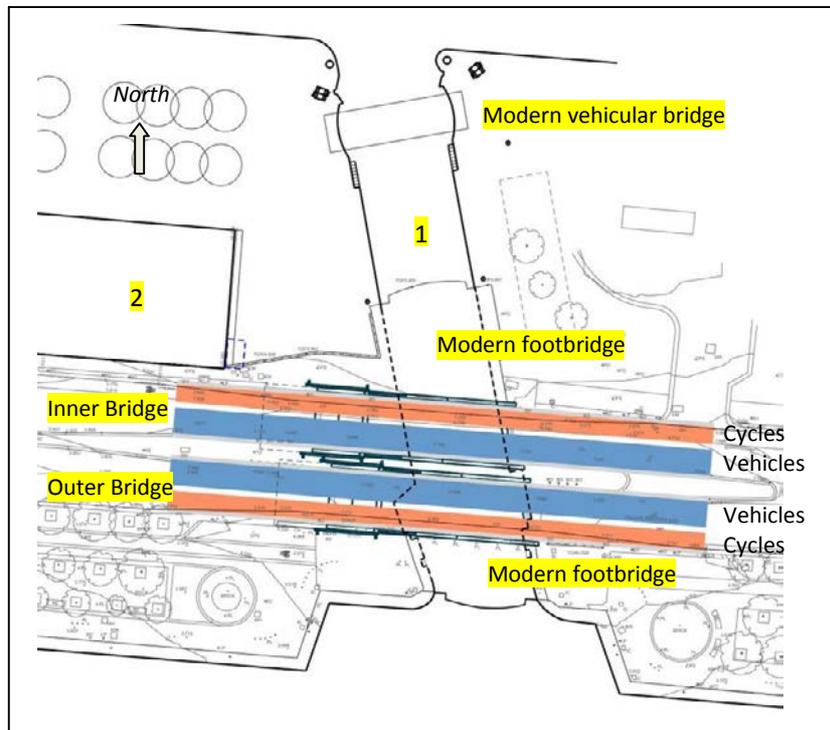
Plan of existing bridges over entrance to George's Dock.
